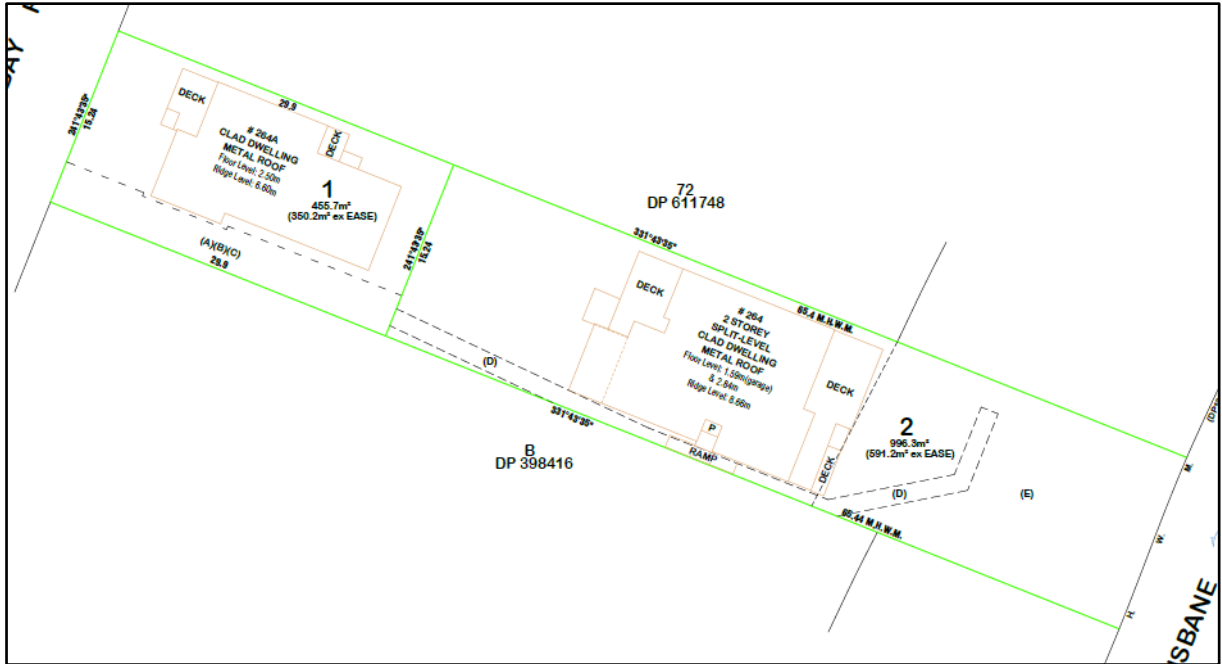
Proposed Plan of Subdivision (Source: Clarke Dowdell & Associates)
